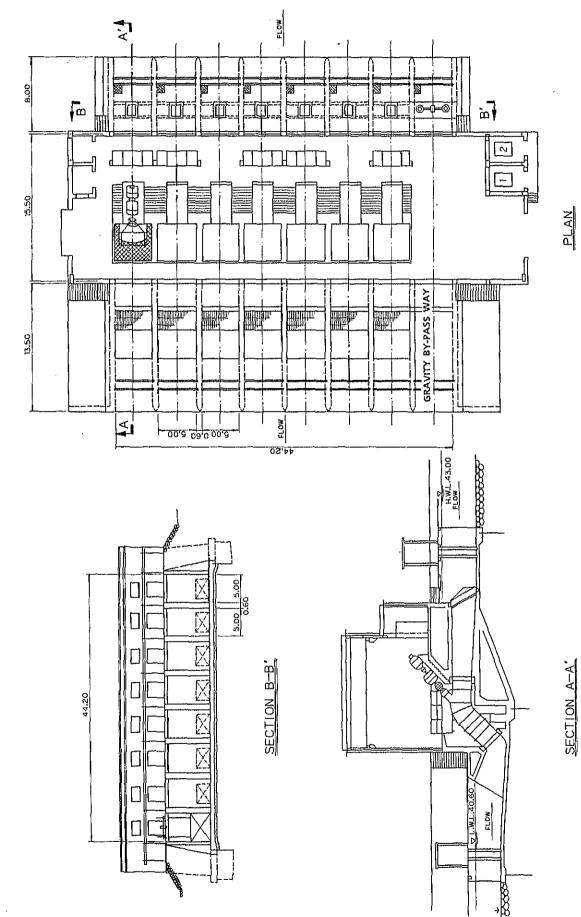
Proposed Plan of El Badraman Drainage Pump Station
